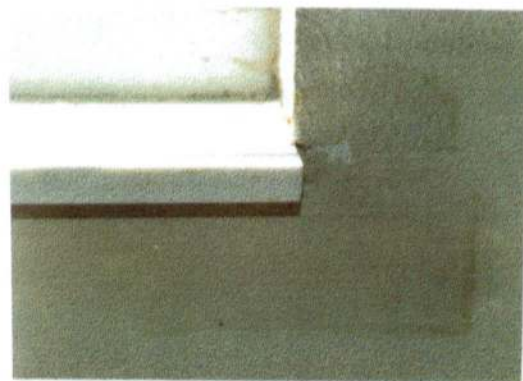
Look carefully at interior surfaces at and below windows. If you see staining like this, I can assure you there's structural damage concealed in the wall.
